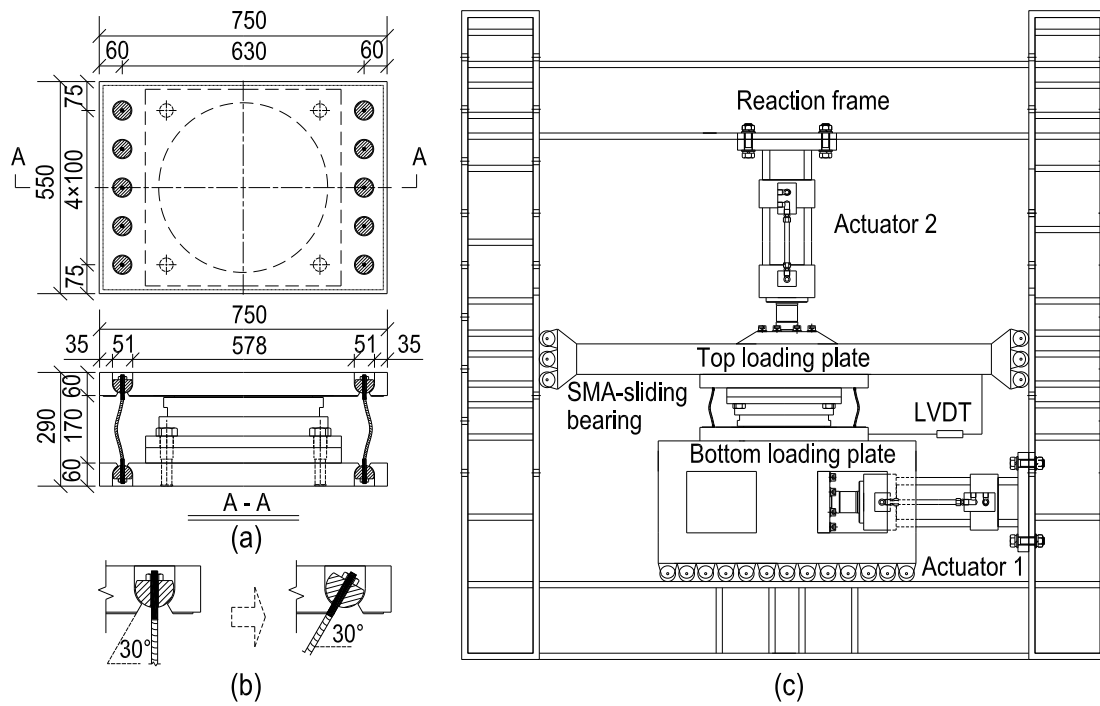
Illustrations of a) geometric configuration and dimensions of specimens, b) detail of spherical hinge c) test setup
